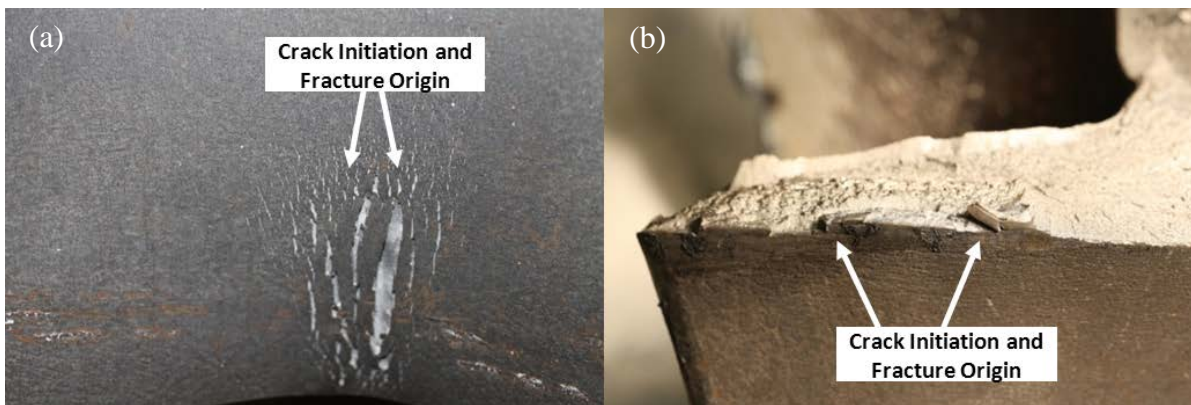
Crack Initiation and Failure Origin in the Top Flange Surface Before Fracture Occurrence (a). After Fracture Occurrence of Crack Initiation and Fracture Origin Location (b).
